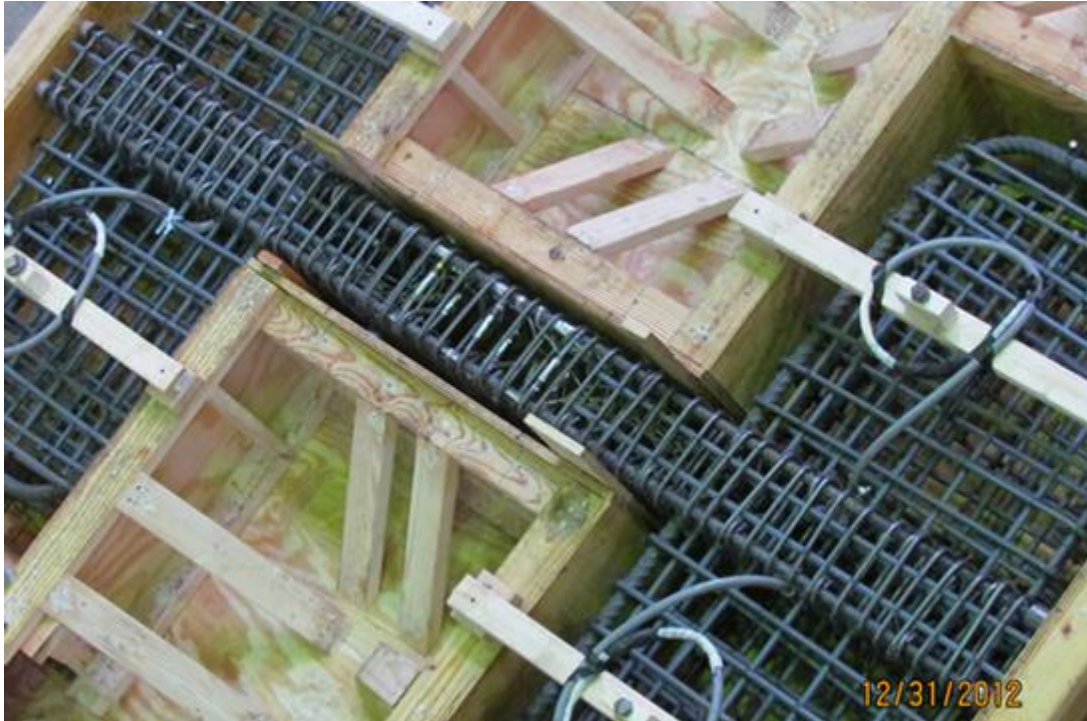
Reinforcement of confined concrete column inside the wooden form
